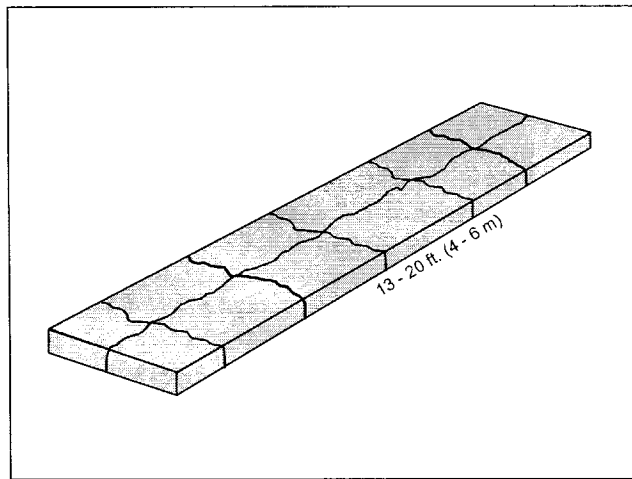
Crack pattern in unjointed pavement due to environmental and load stresses
